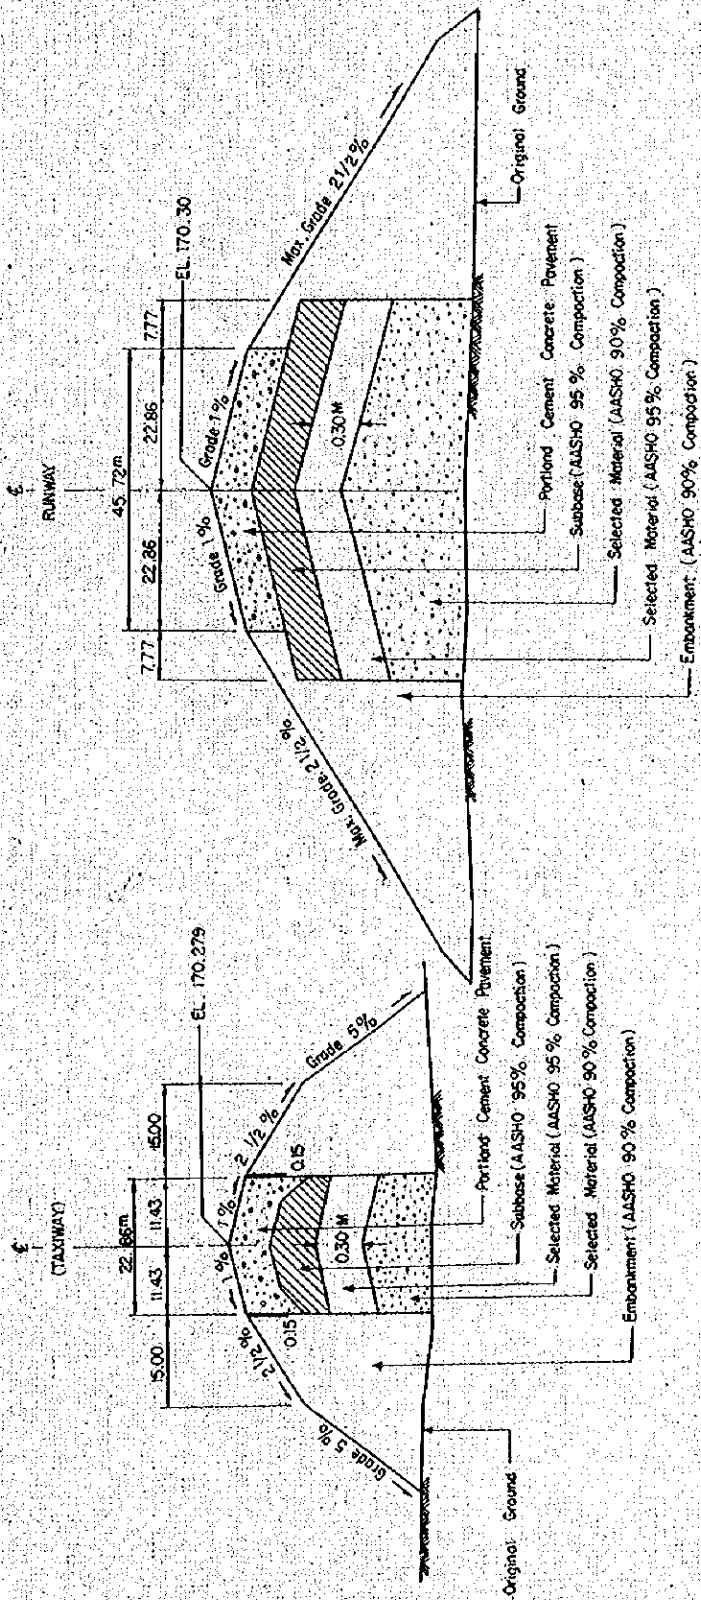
TYPICAL CROSS SECTION OF RUNWAY AND TAXIWAY
